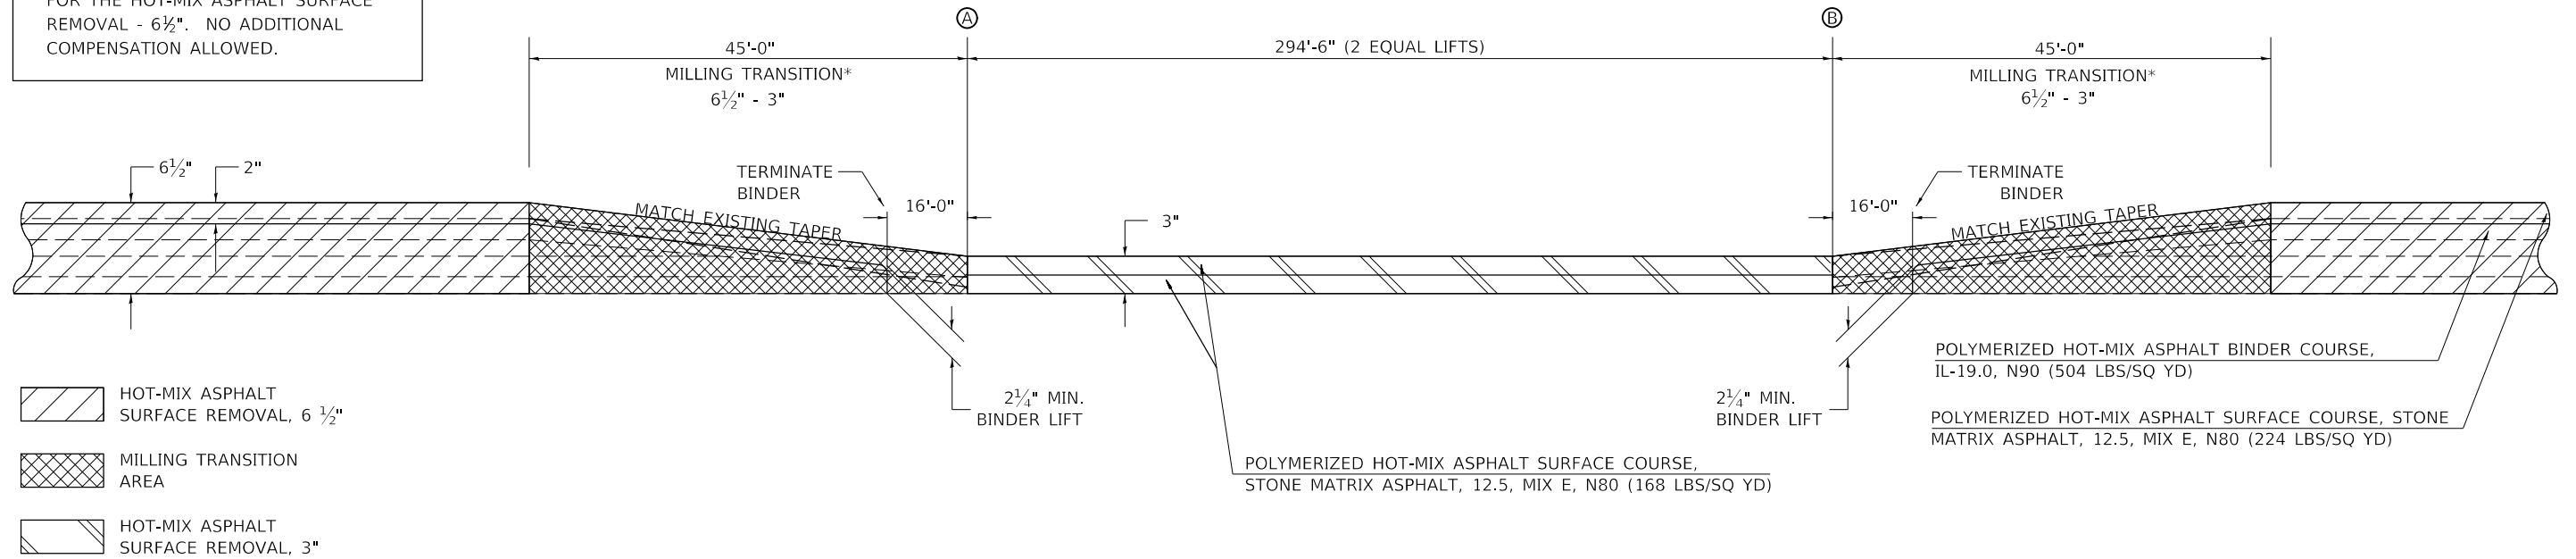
# DETAIL FOR MILLING & RESURFACING MAINLINE PAVEMENT UNDER S.N. 010-0207 & 010-0208
